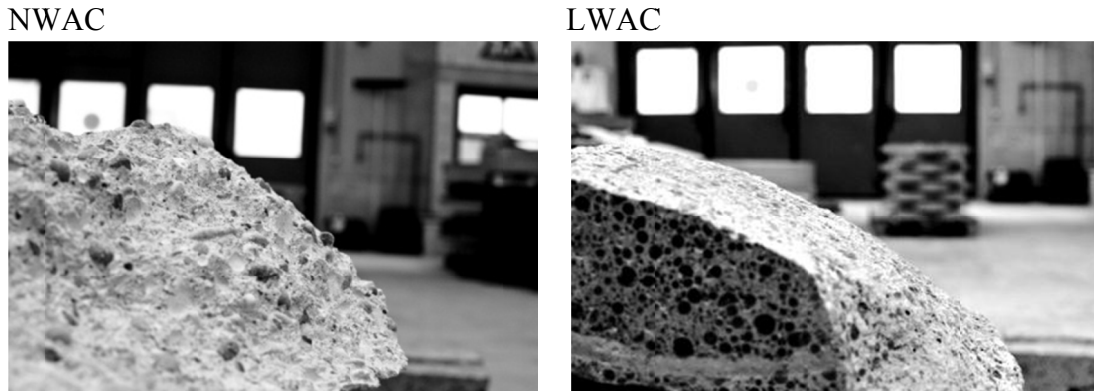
Local roughness of a bending shear crack surface of normal concrete (left) and lightweight concrete (right) at a specimen after testing.
